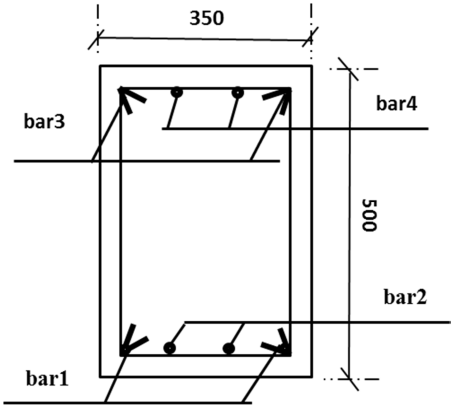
Designation and arrangement of the steel bars in the cross-section
